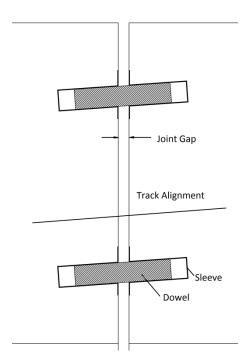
Detail of Dowels in One-Column Cap Beam
